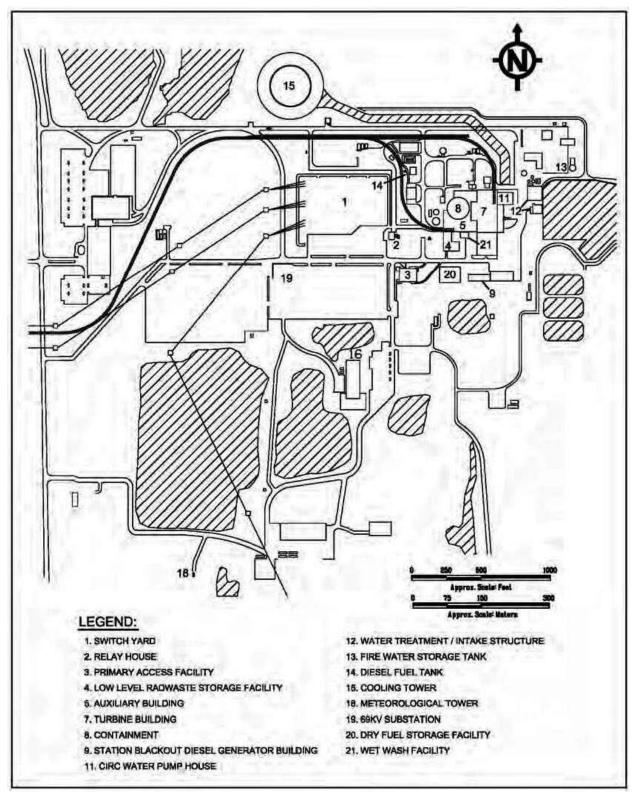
Davis-Besse Site Boundary and Facility Layout
